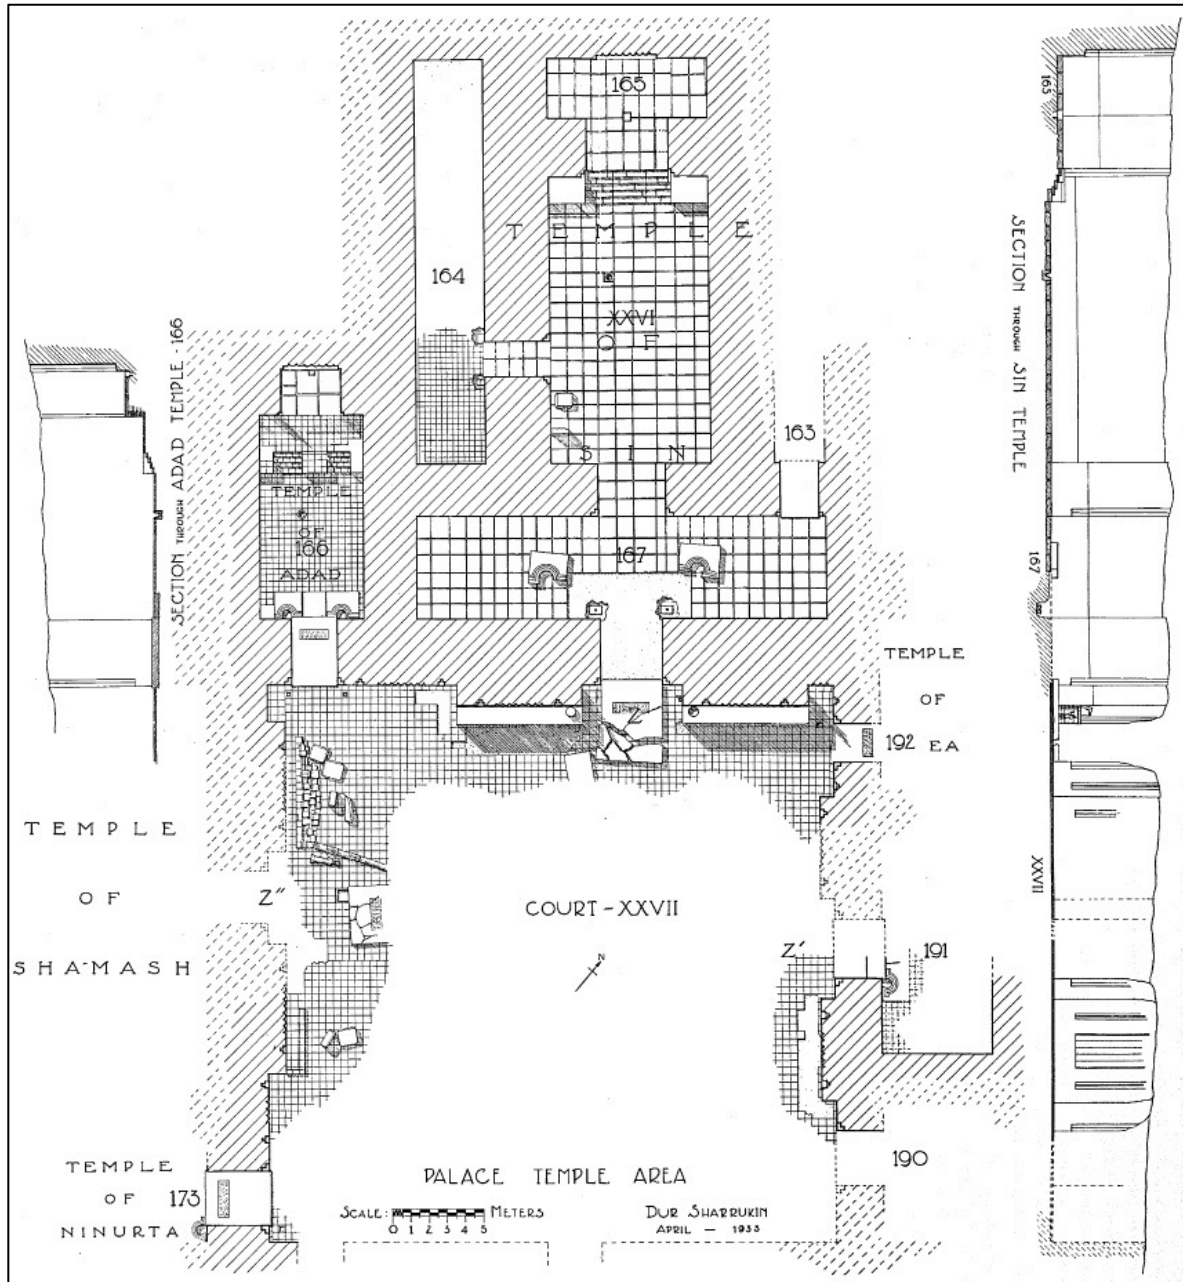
Plan and sections of Court XXVII, and those adjoining rooms which were excavated by the Iraq Expedition. Loud 1936: fig. 98.
